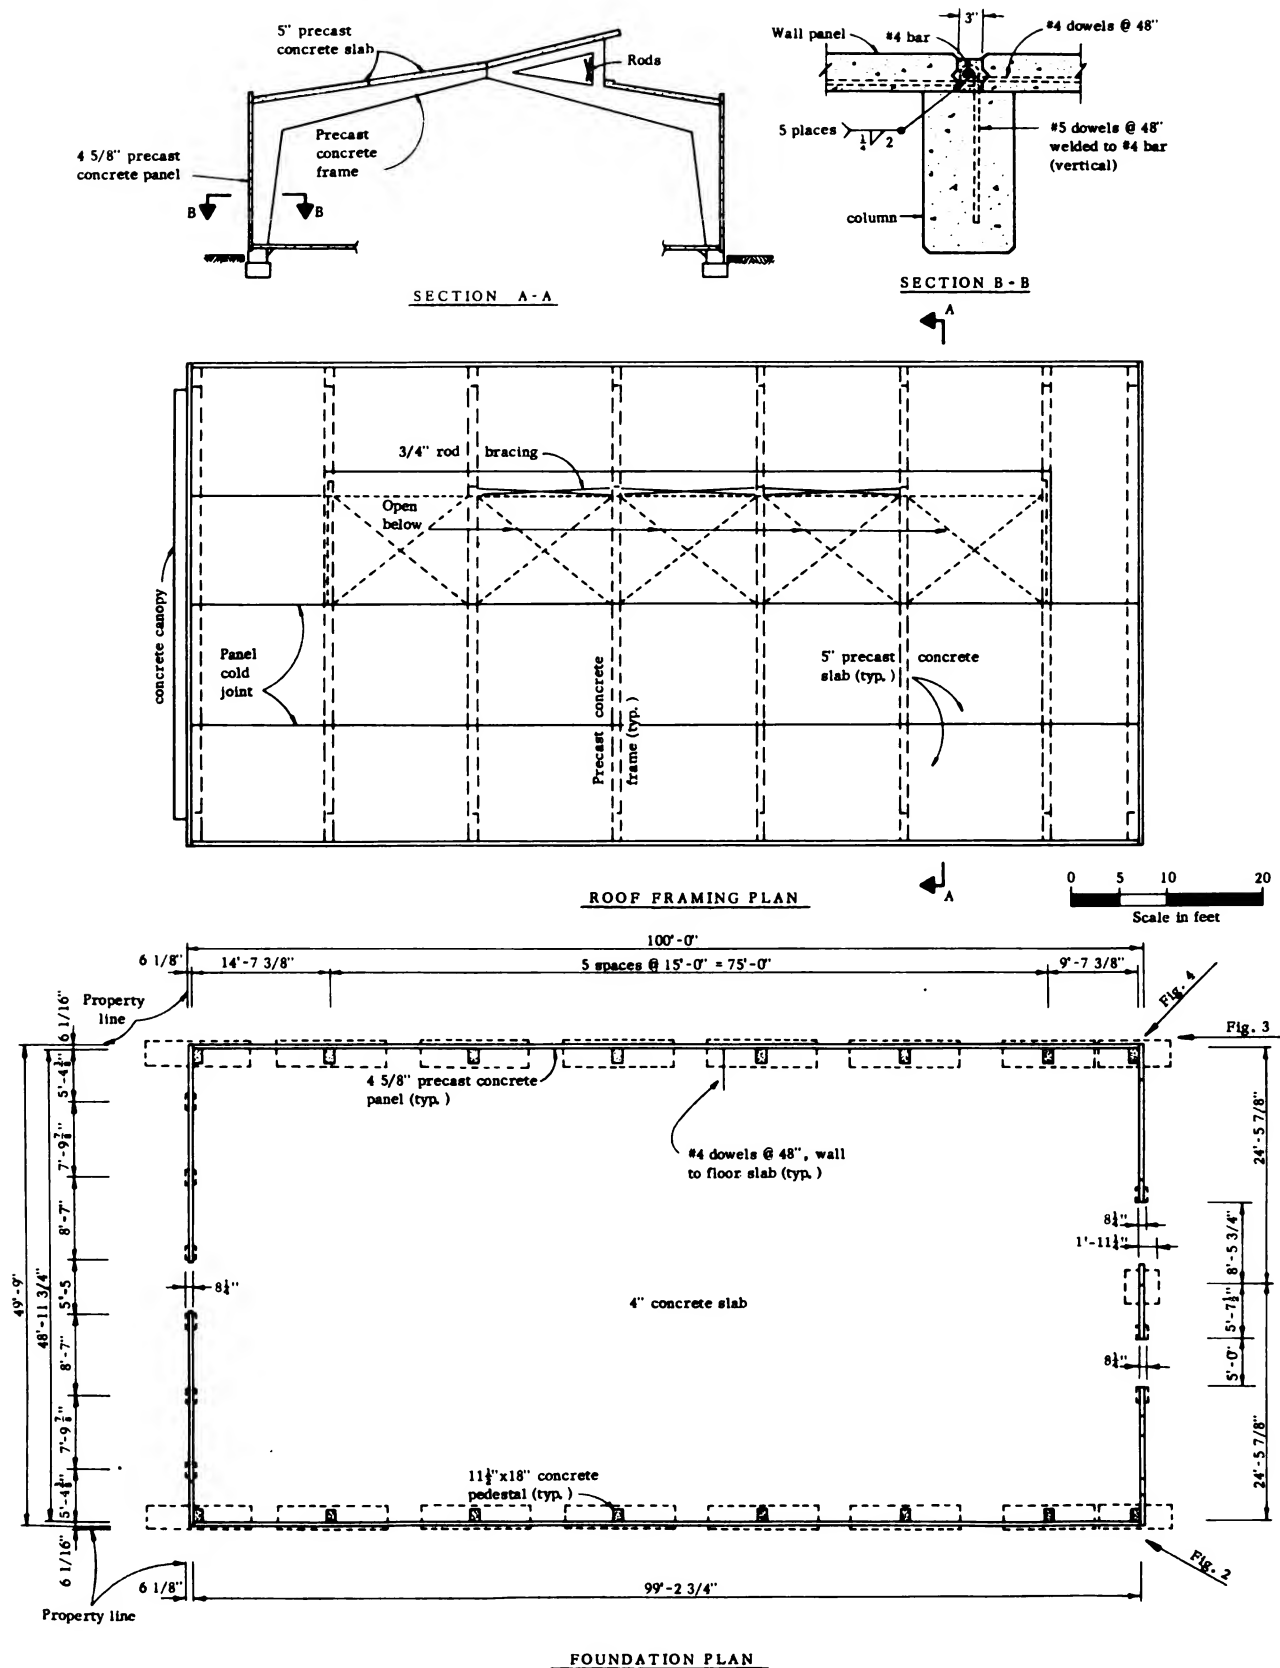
Goodwill Industries. Roof framing plan and foundation plan.
